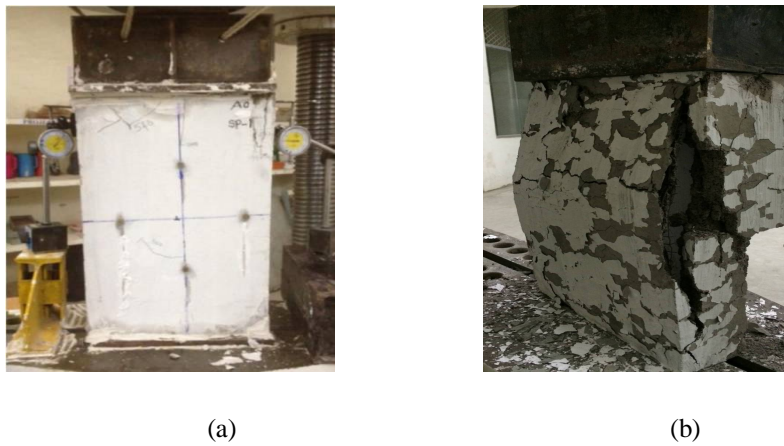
(a) Test setup for compression in panel, (b) cracks in the panel
